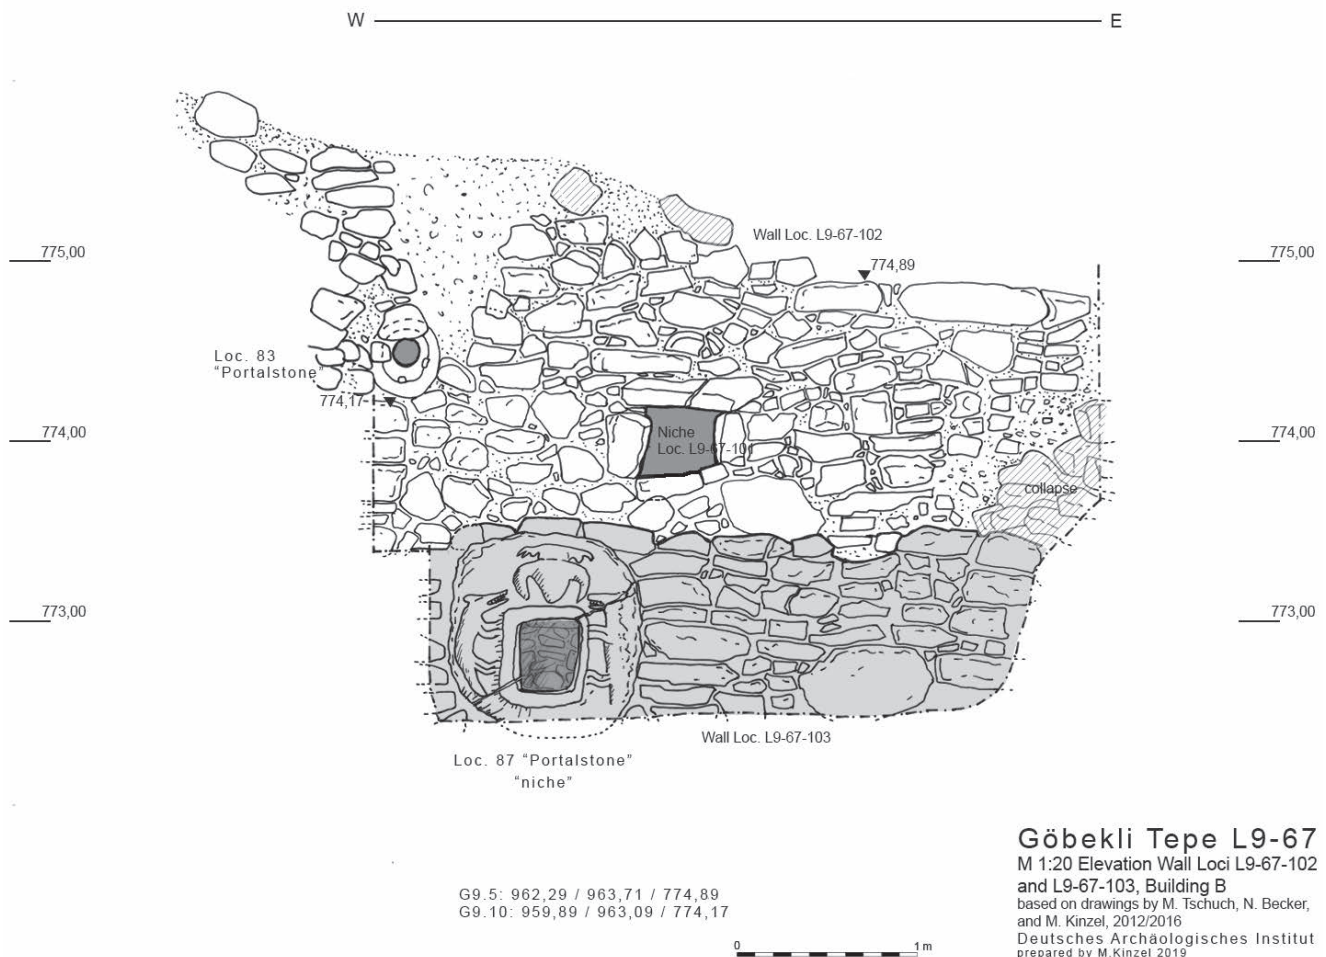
Göbekli Tepe Building B. Elevation drawing of walls L9-67-102 and L9-67-103 with niches L9-67-101 and L9-67-87 (DAI, Kinzel 2016 based on M. Tunsch, N. Becker).
